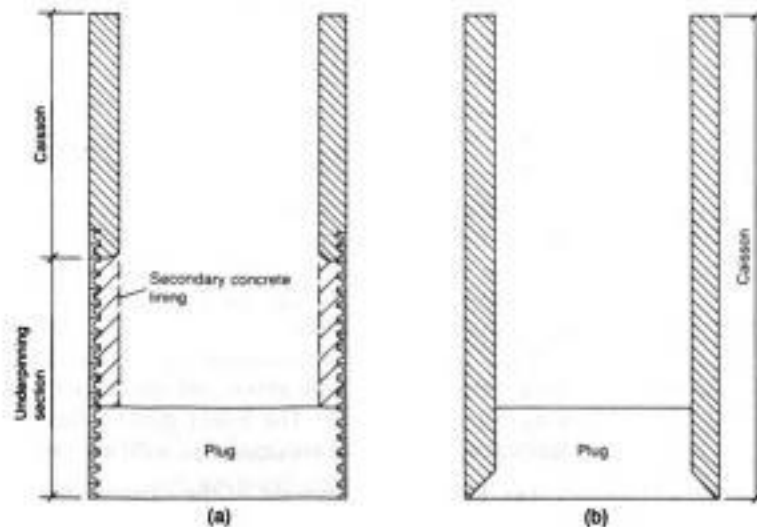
Cairo waste water scheme, alternative methods of shaft construction: (a) Engineer's original design; (b) Contractor's design (Flint *et al.*³¹)
